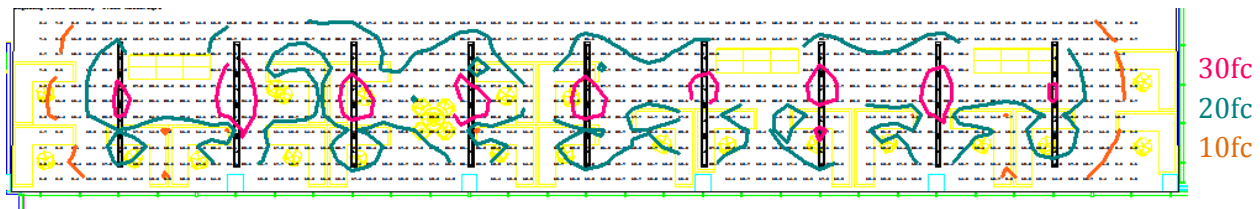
3rd Floor Open Office Illuminance Contours Plan View
